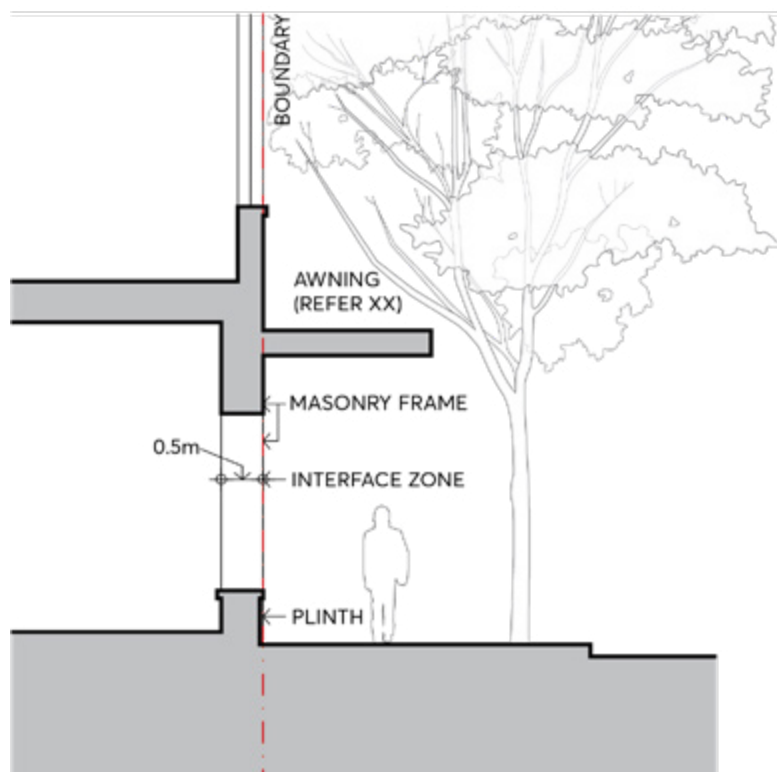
Active Ground Floor Frontage
